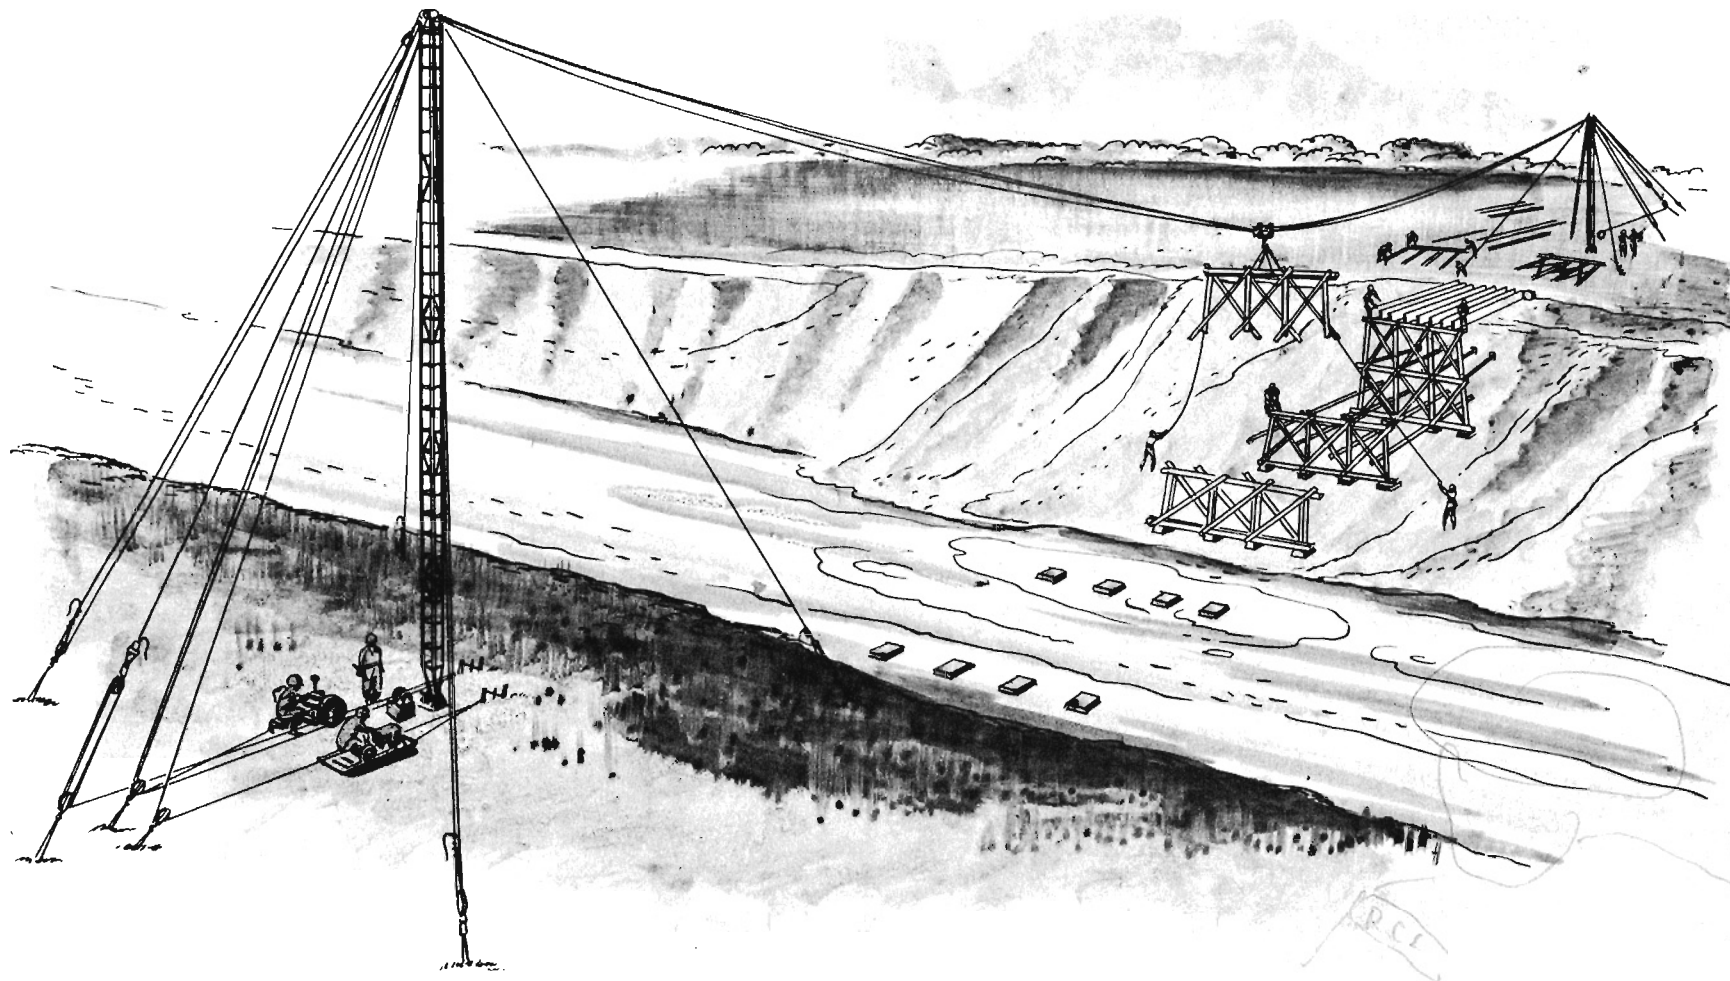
Medium cableway in position over bridge center line for erection of bridge.
